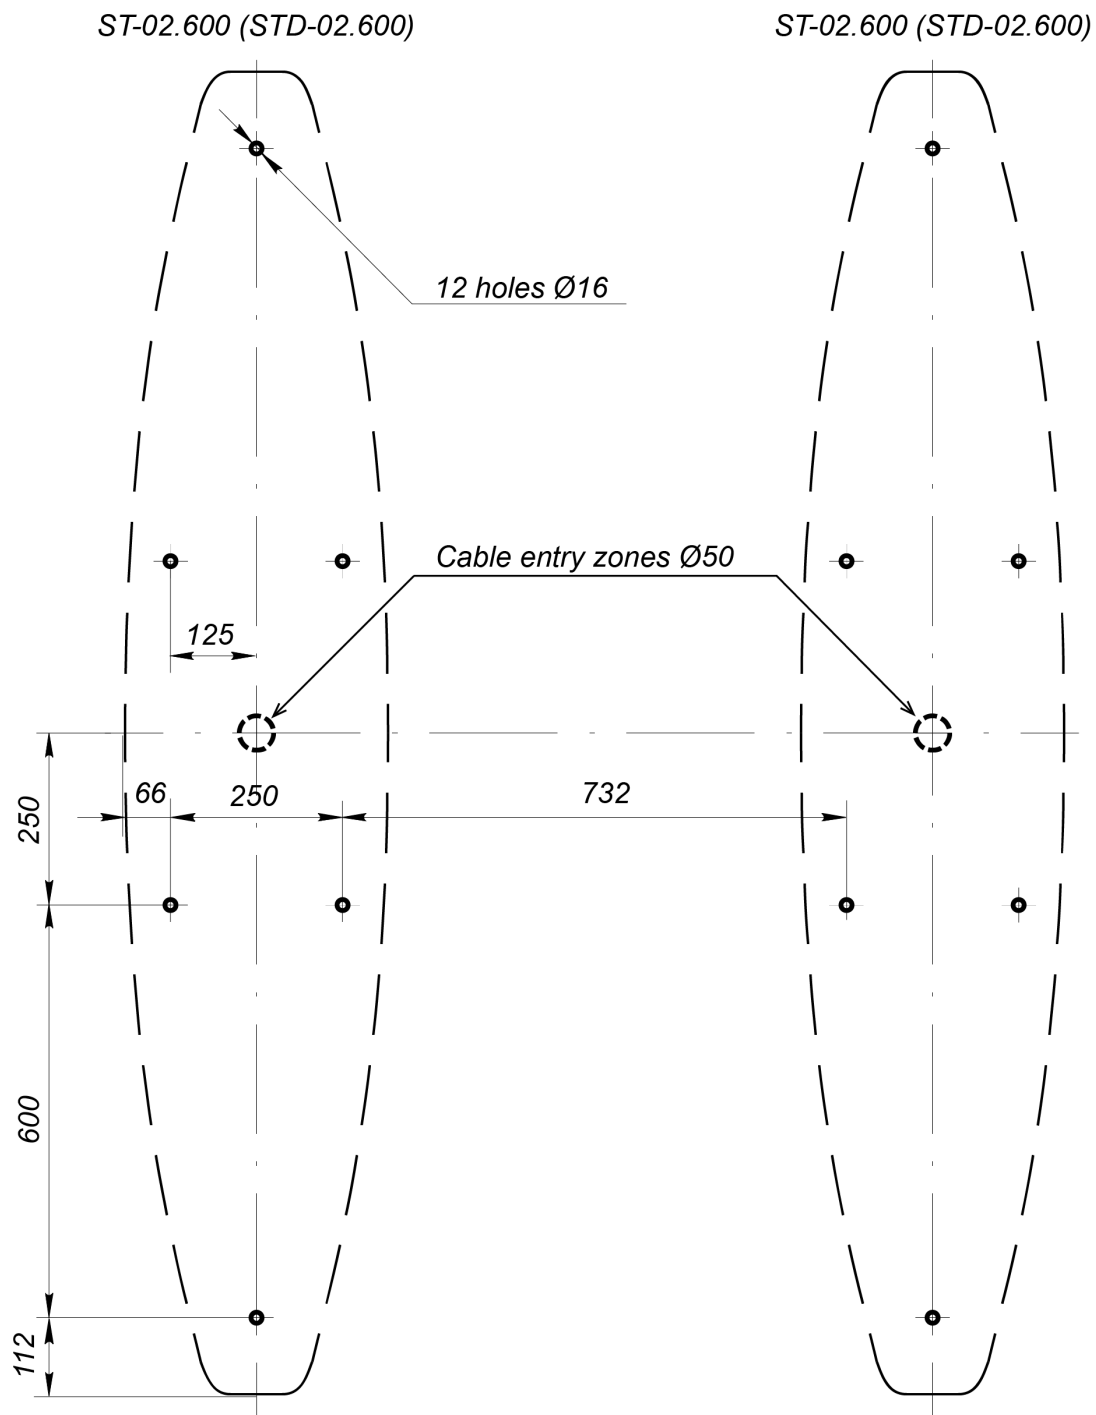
Layout for installation of the sections with the passageway width of 600 mm (ST-02.600, STD-02.600)
